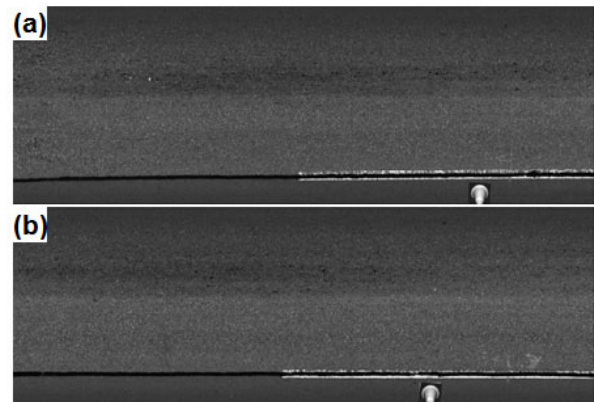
Pavement Surface Inspection (Motorway)
